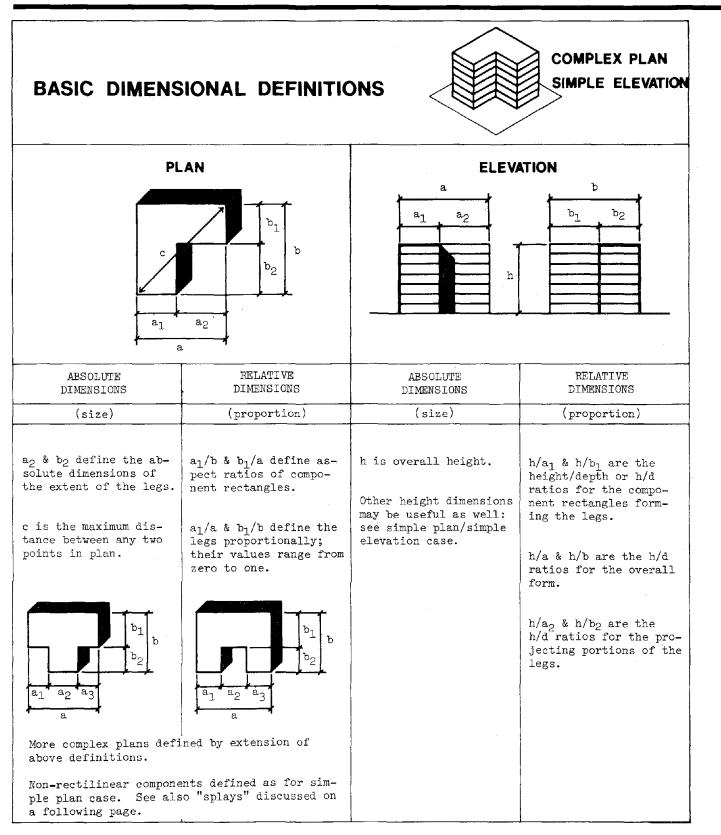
Complex plan/simple elevation: basic dimensional definitions.
